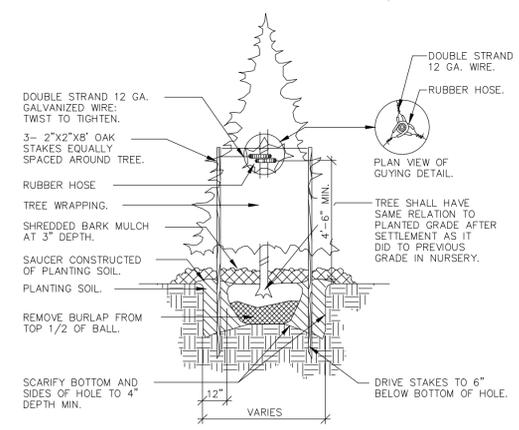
DETAIL CATERED LIVING FACILITY ENTRY LANDSCAPING VIEW
